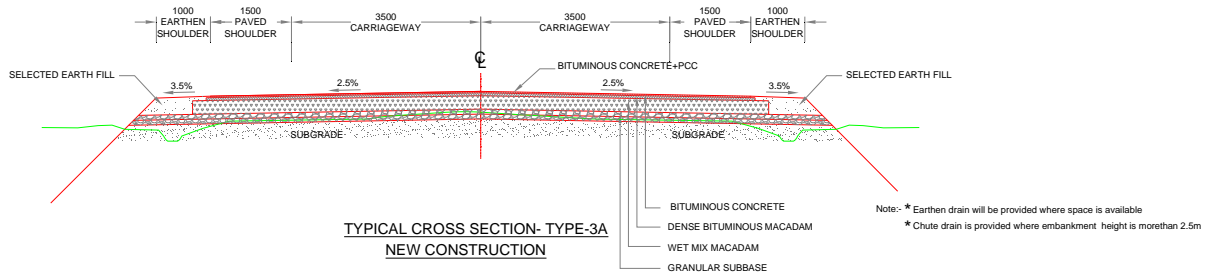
TYPICAL CROSS SECTION- TYPE-3A
